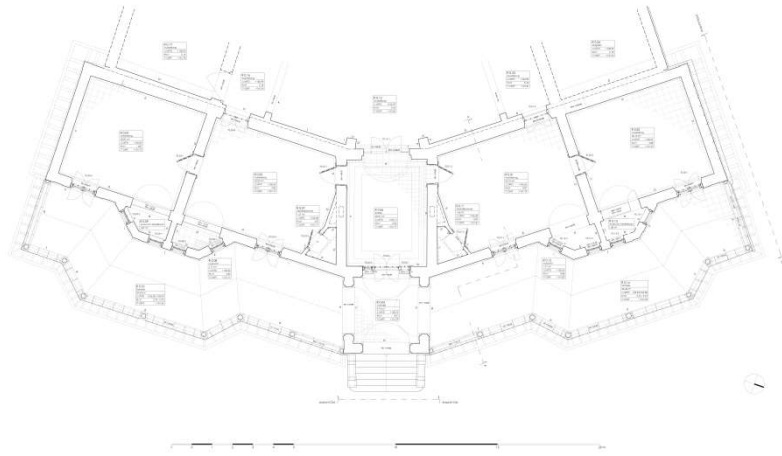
Floor plan of the 1906 building with indication of the extension 2010 (drawing: Ch. Straße © DAIK).
